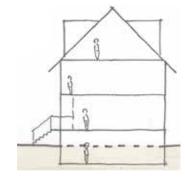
Illustration of 2.5 storey building above a basement. See policy 6.6.1 b).
